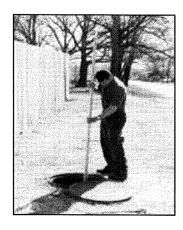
Measuring sediment in swirl chamber using stadia rod. Inspections are performed from the surface through the manhole access cover.
